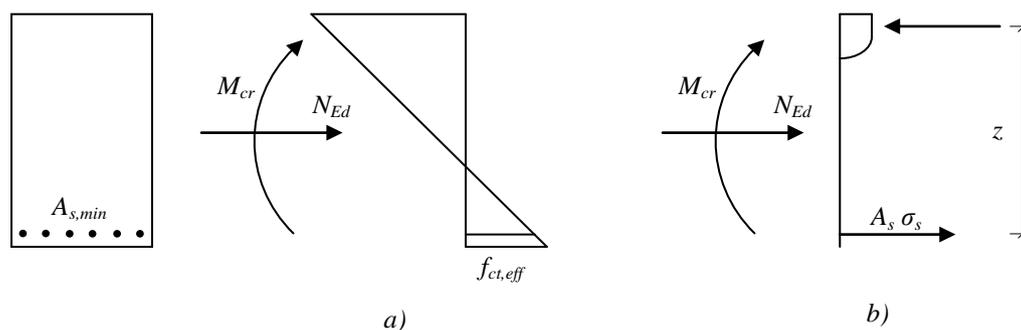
Model used for derivation of the minimum reinforcement amount according to ECP (2008a), a) uncracked cross-section b) cracked cross-section.
